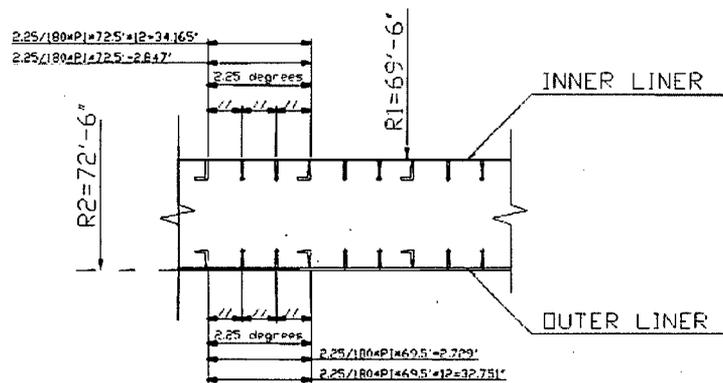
SEB1-02-7 Typical SB Cylinder SC Module - Cross-Section
